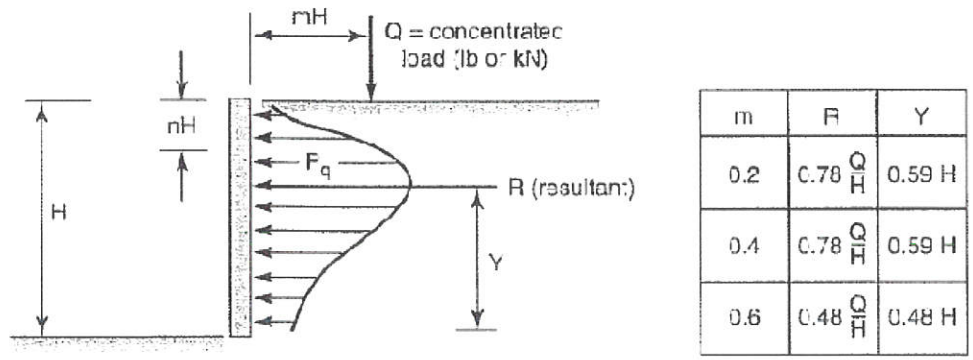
Pressure distribution against vertical wall resulting from point load, Q.
